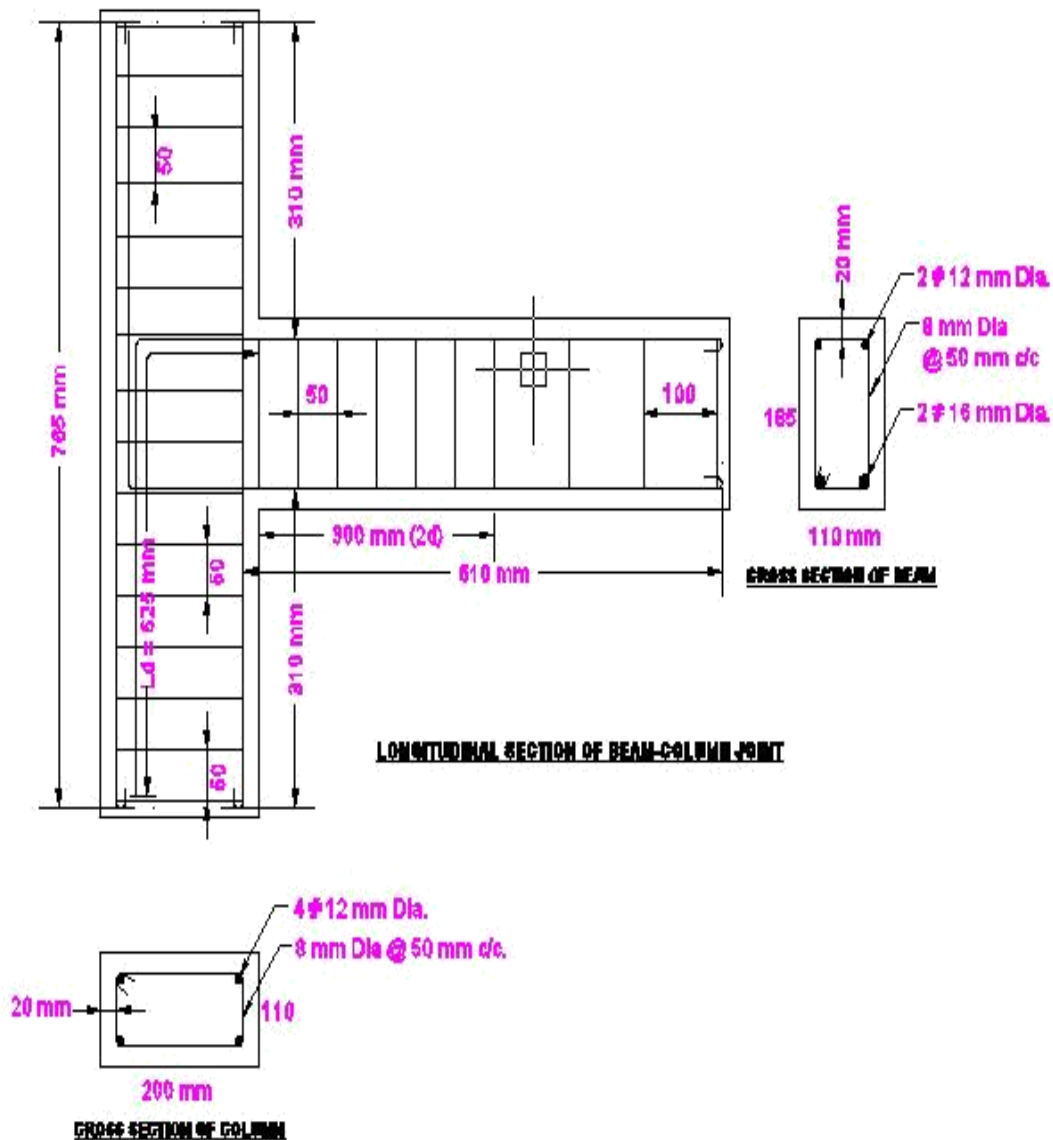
Fabrication of Reinforcement Details of Beam- Column Joint
